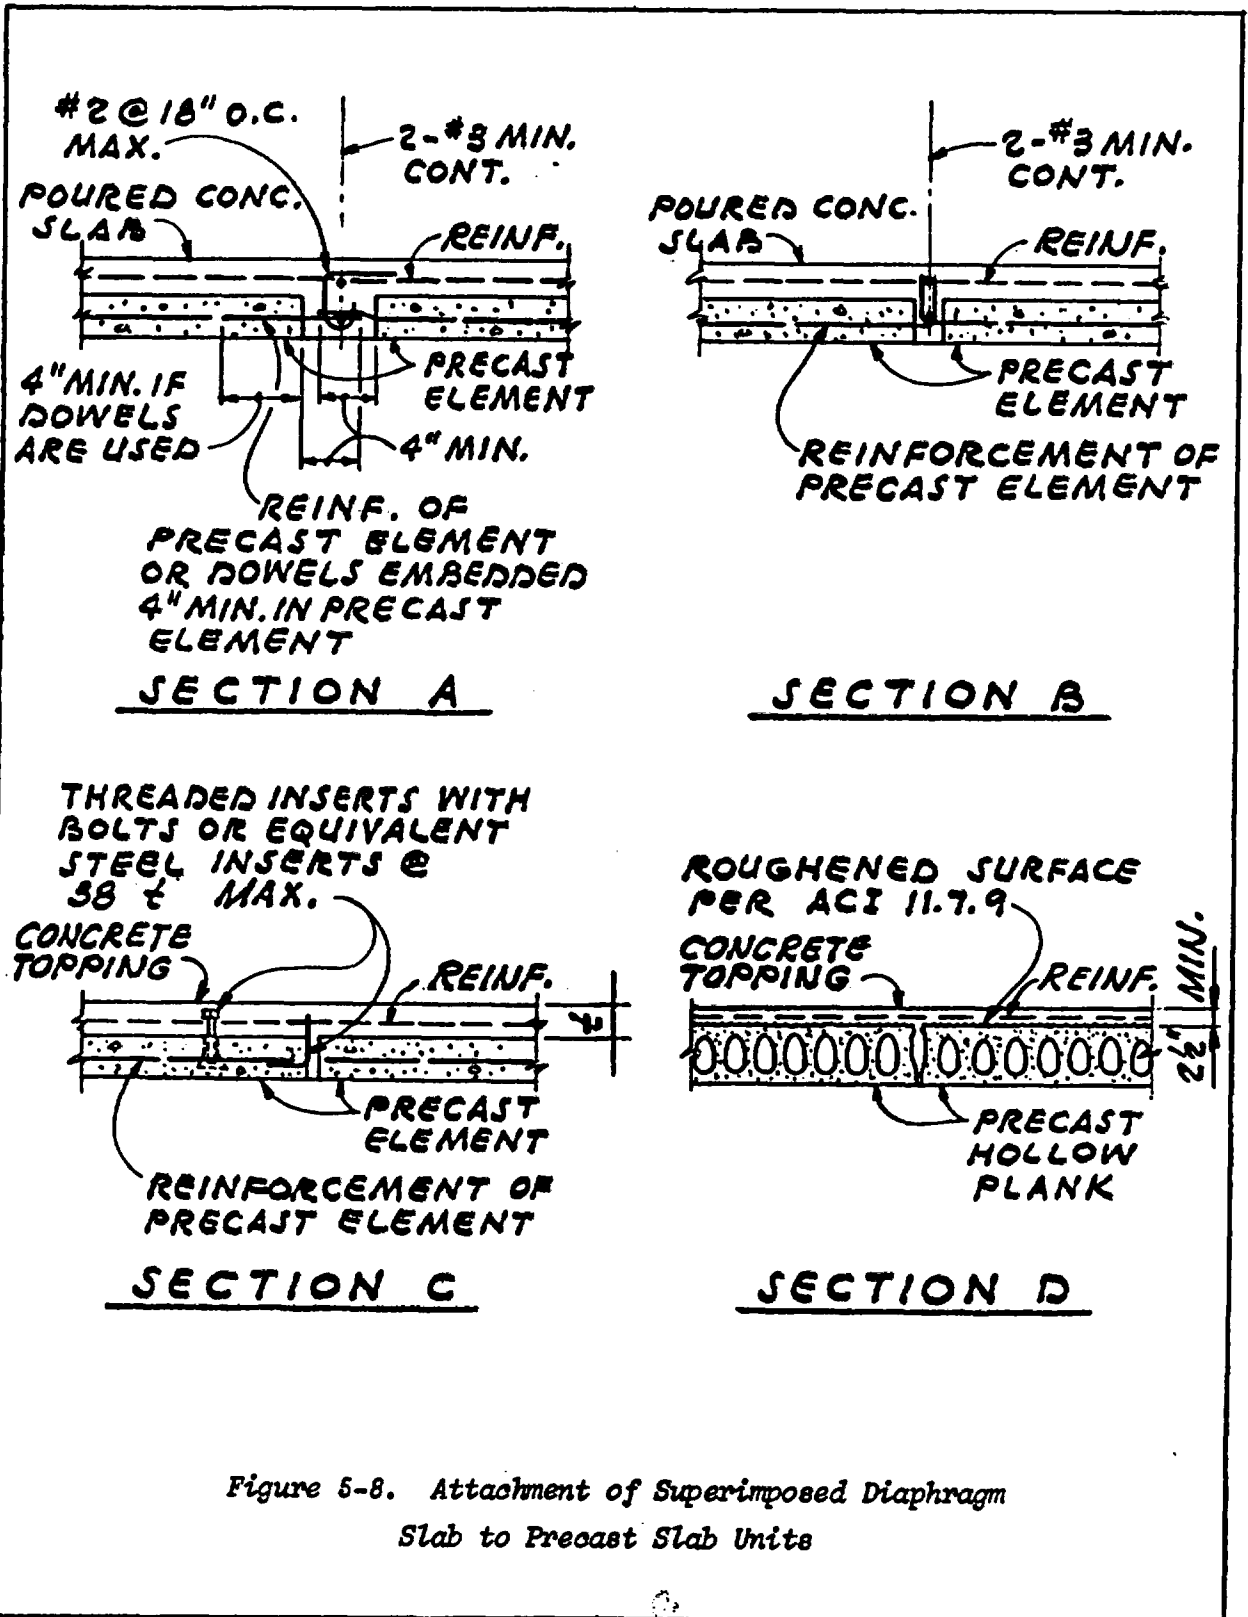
Attachment of Superimposed Diaphragm Slab to Precast Slab Units
